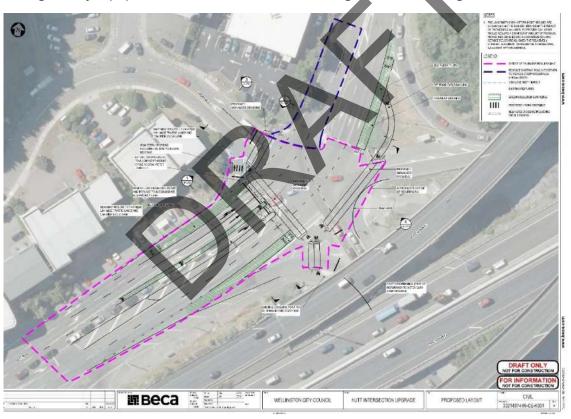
Specimen Design Diagram of the Hutt Road / Jarden Mile Intersection
